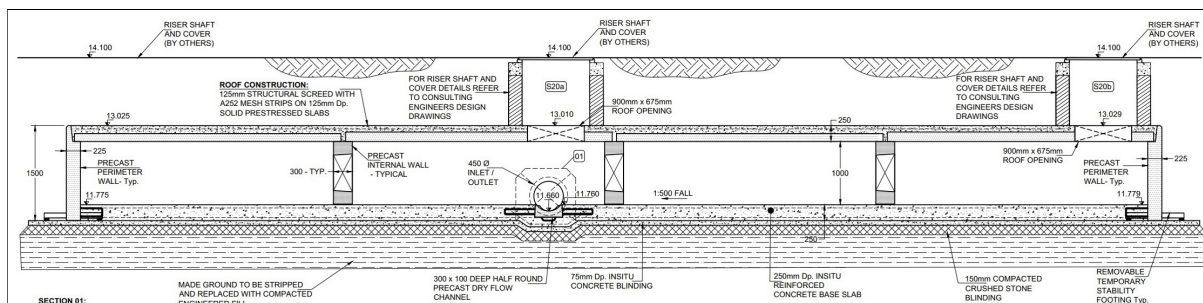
Attenuation RC tanks -typical cross section detail (Carlow tanks)
